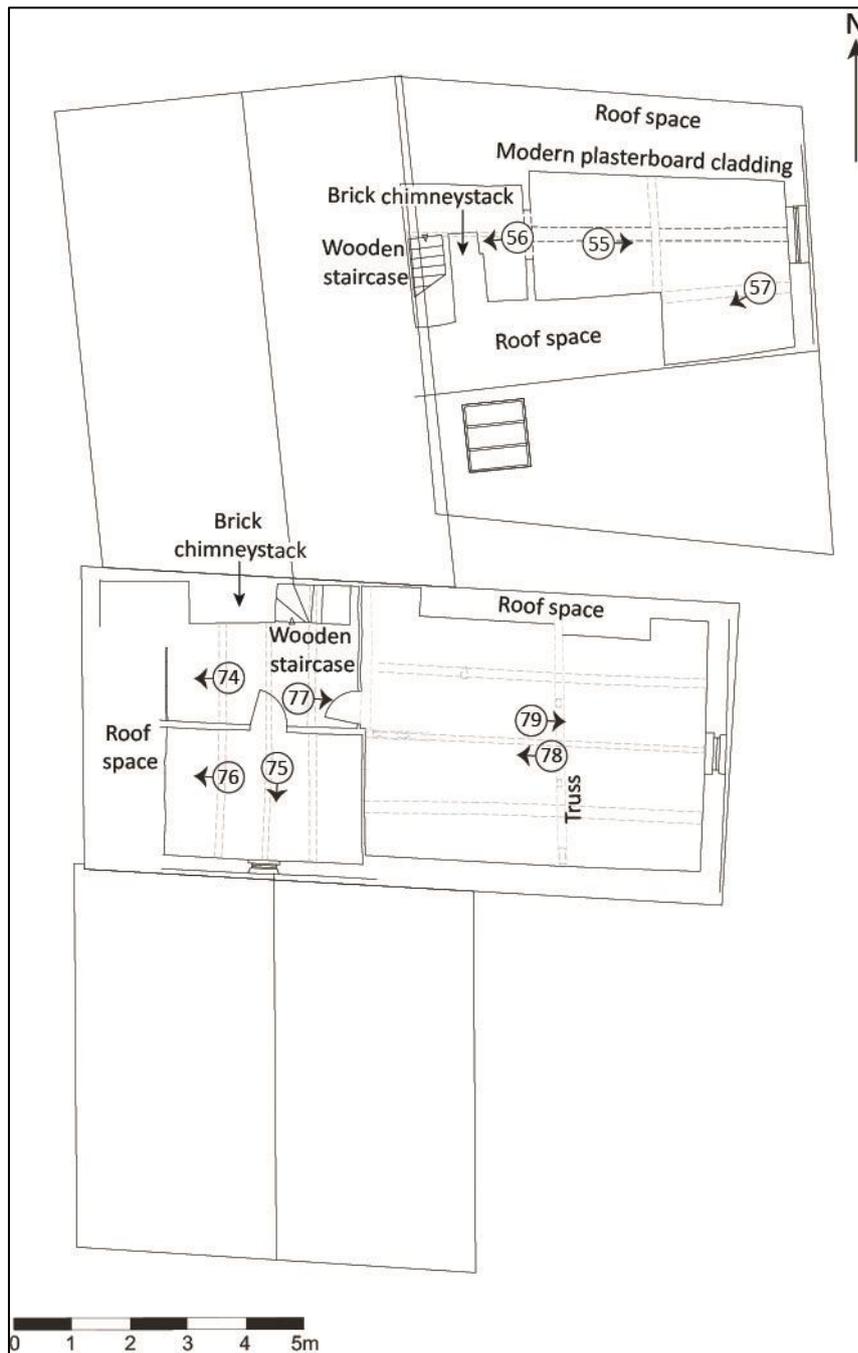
Annotated plan of attic space in Nos. 17 & 17A showing locations of photos taken
